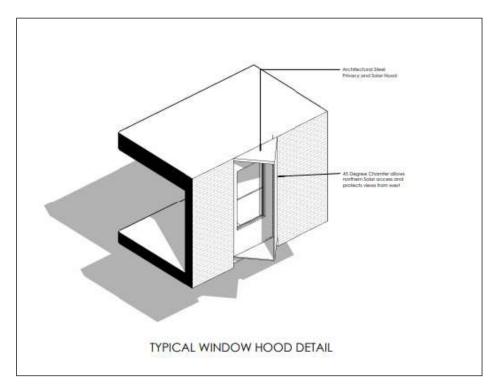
window hoods for privacy to side dwelling facades on upper levels
